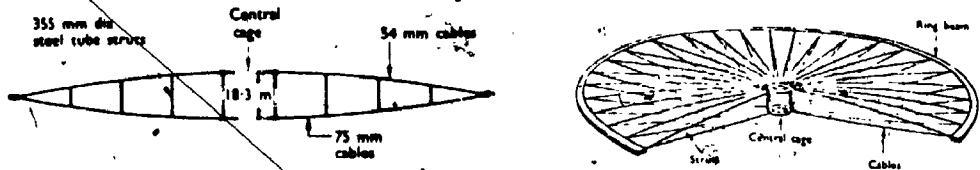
Cross-section of Bicycle Wheel-shaped Roof, (Circular in Plan)
